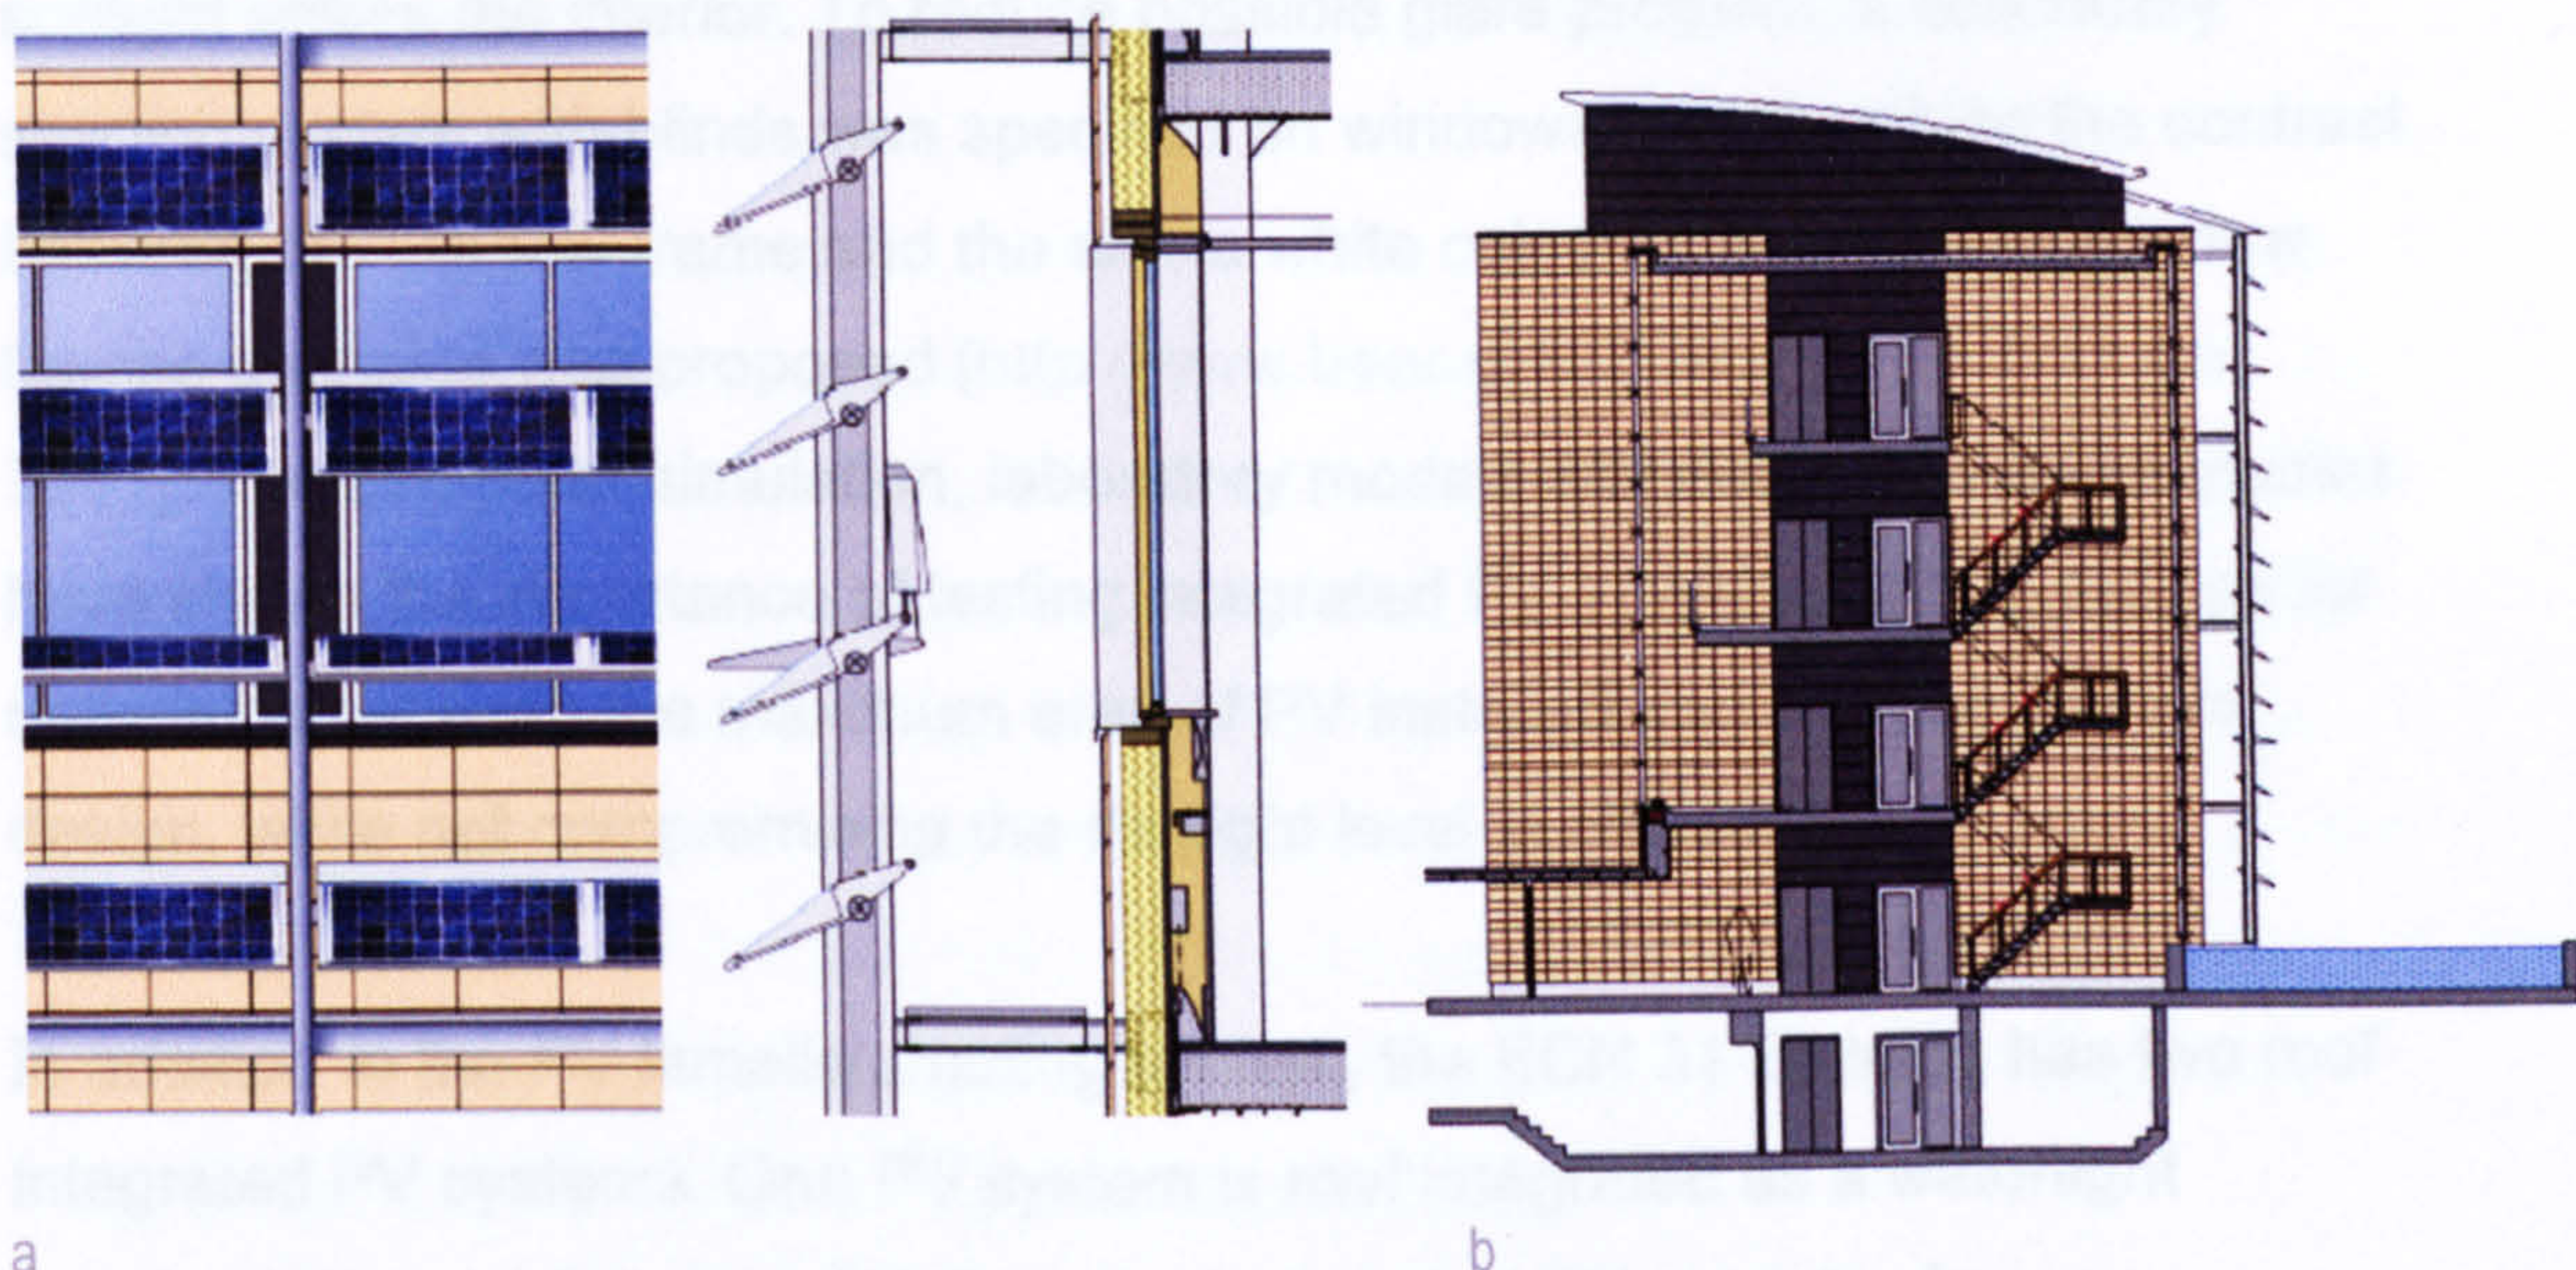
[a-b] ECN building 31, Petten, the Netherlands, retrofit with BIPV as sun shading. South elevation, section and west elevation
